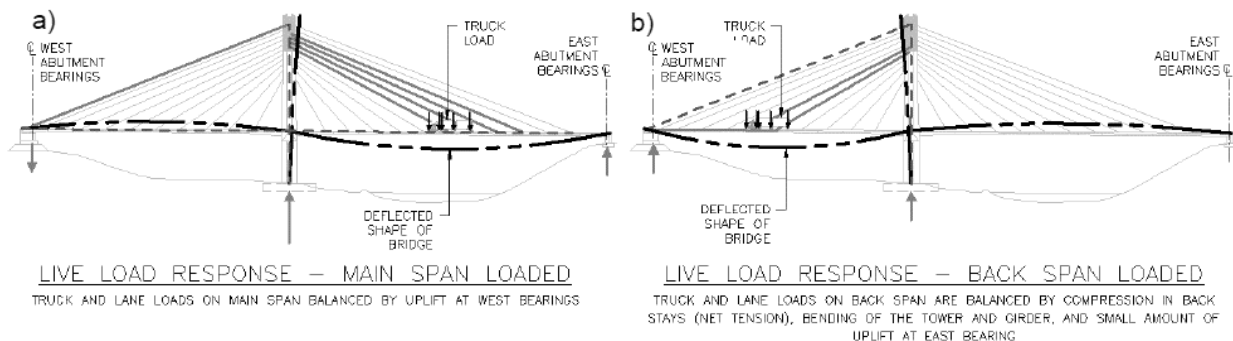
Bridge behaviour of truck passing on (a) East span (b) West span
